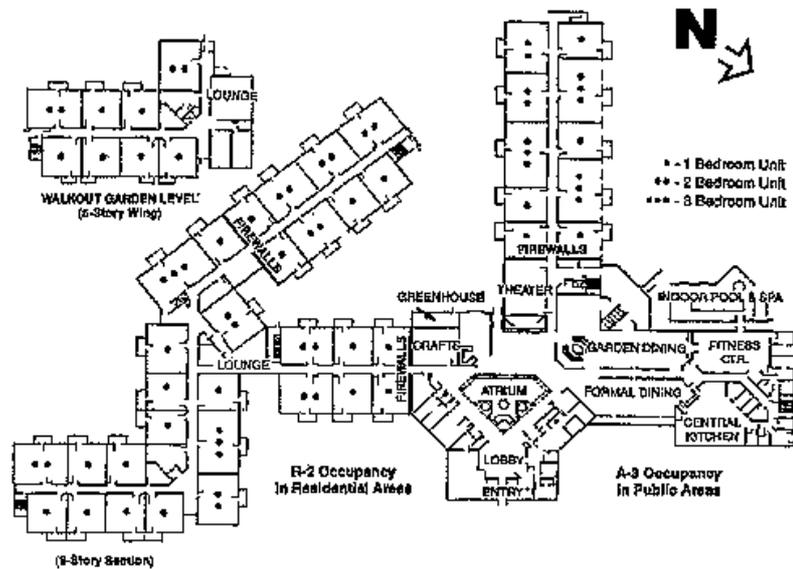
Floor Plan for The Gatesworth at One McKnight Place
